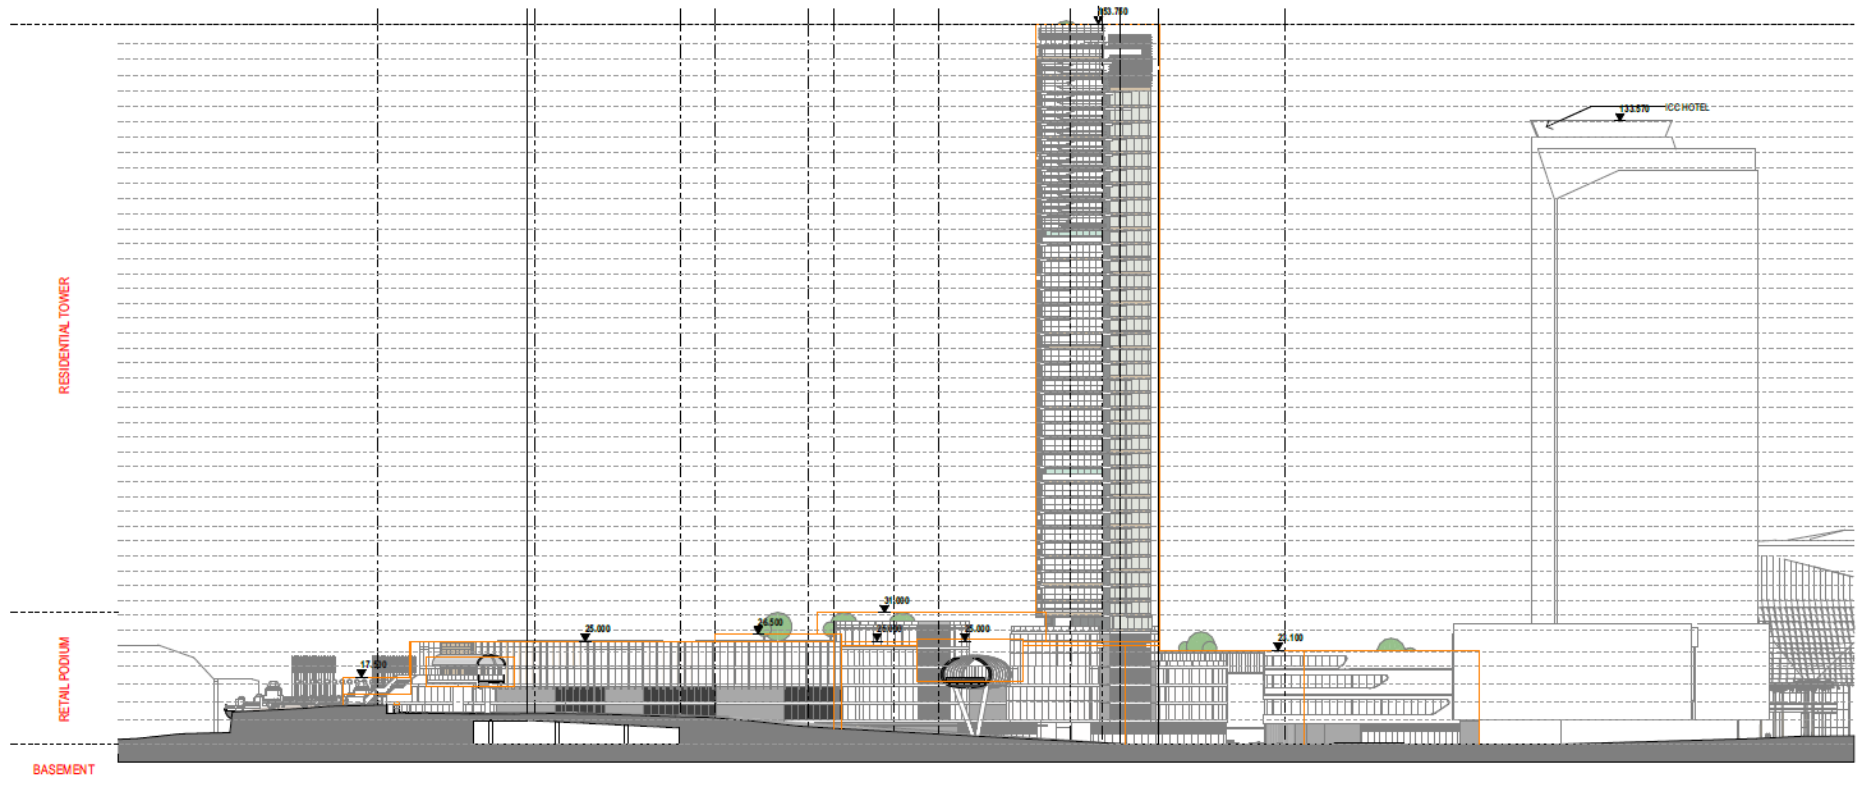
West Elevation – Indicative Elevation Only (Source: FJMT, 2020)
